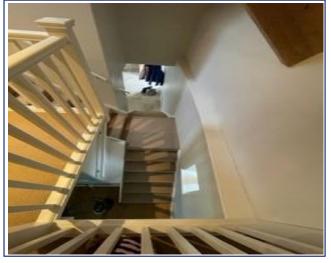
The Byre Jack and Jill staircase looking at the south and east elevation walls.
